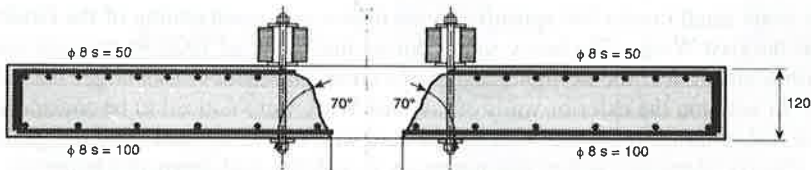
Sketch of the punching crack in the strengthened slab
